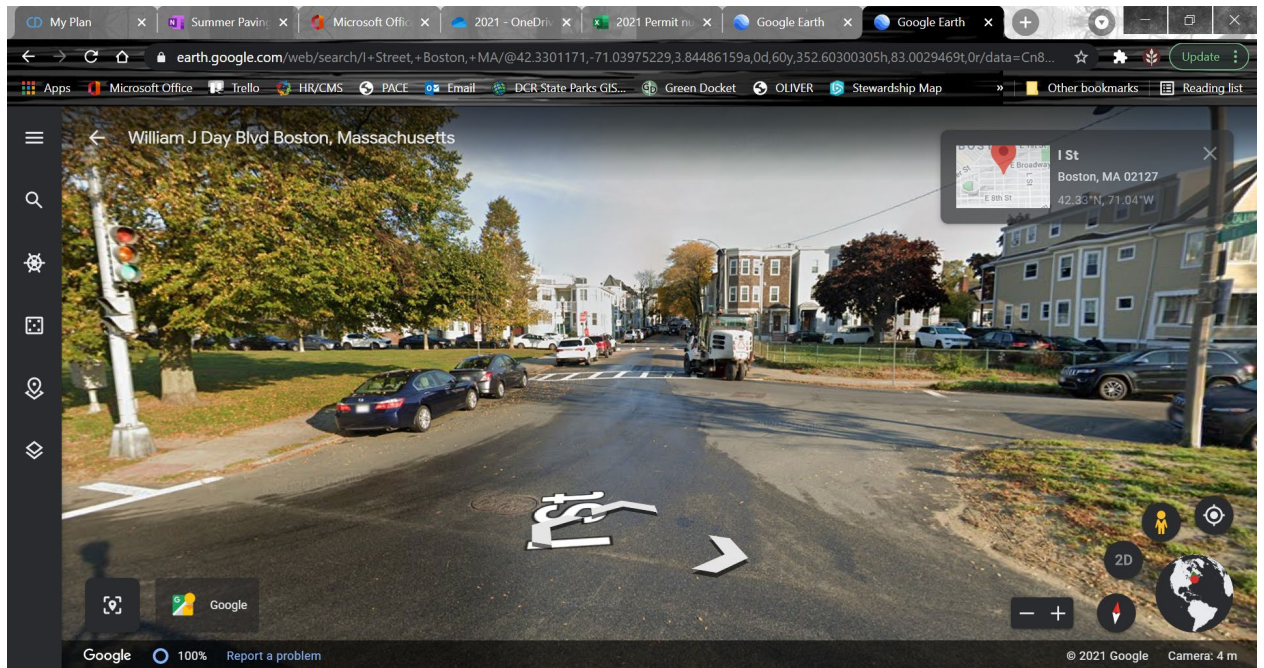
& 2: Views of existing conditions at the intersection where I Street intersects Columbia Road and William J. Day Boulevard. *Facing southwest and southeast.
